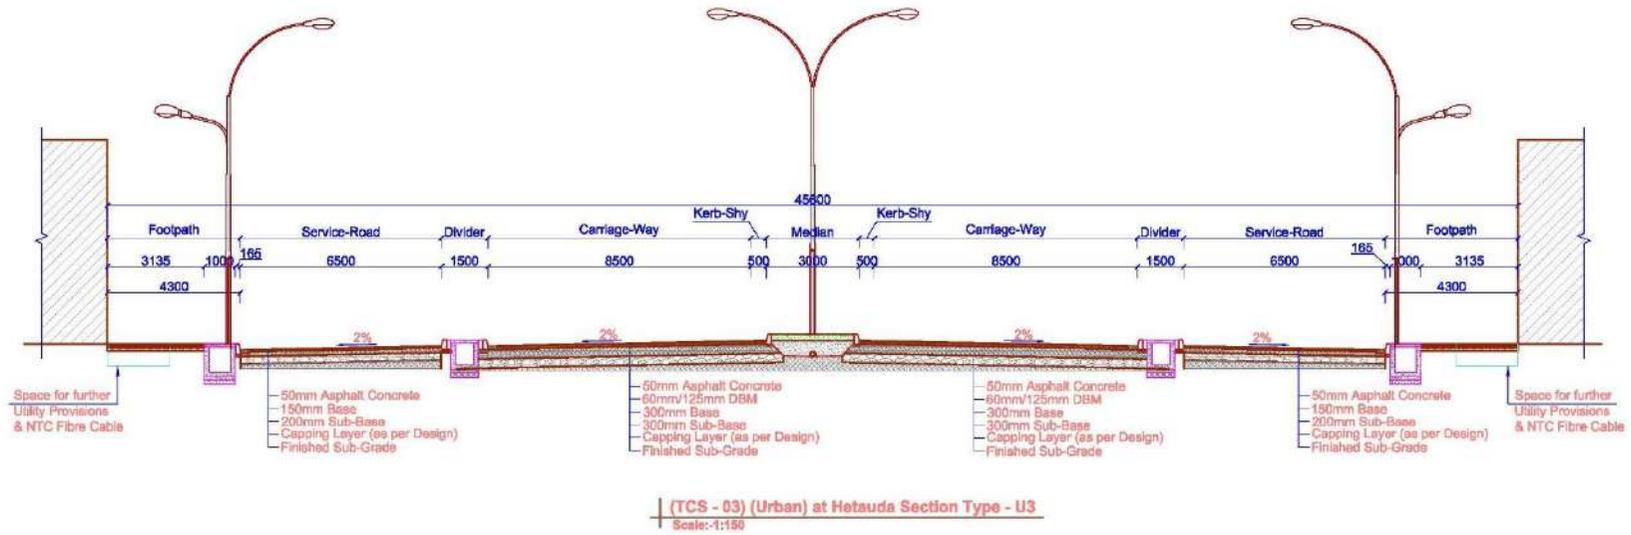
Typical design of road alignment section in urban area of Hetauda Bazaar
